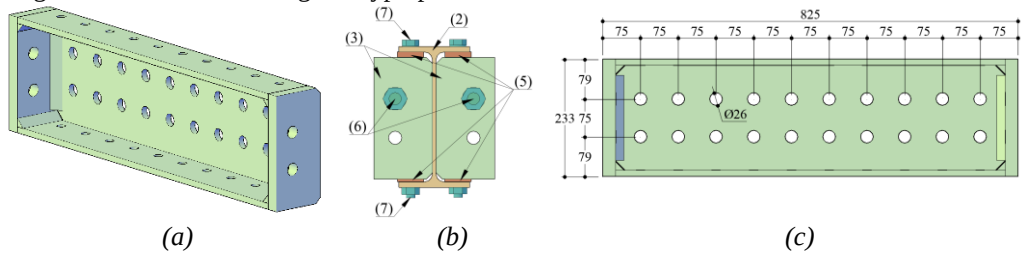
Hyperpack: (a) Isometric view; (b) Packing plates; (c) Dimensions of the hyperpack suitable for IPE270 beam [6]
